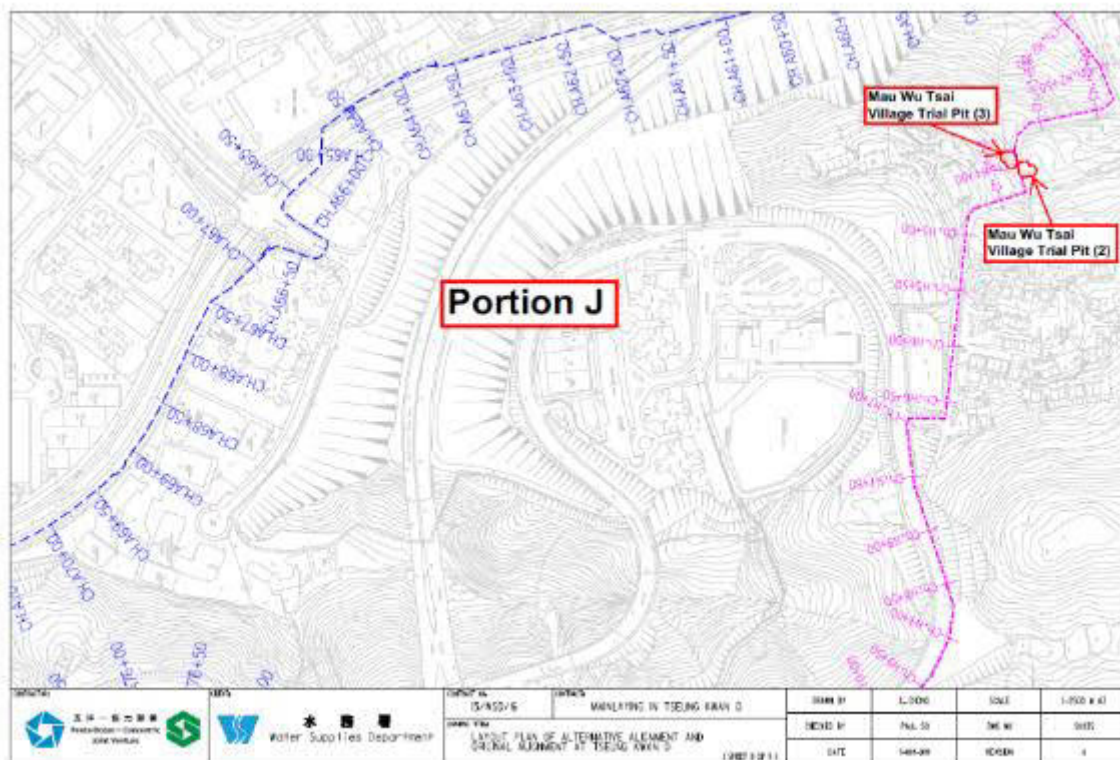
Location Plan for Mau Wu Tsai 2 & 3
